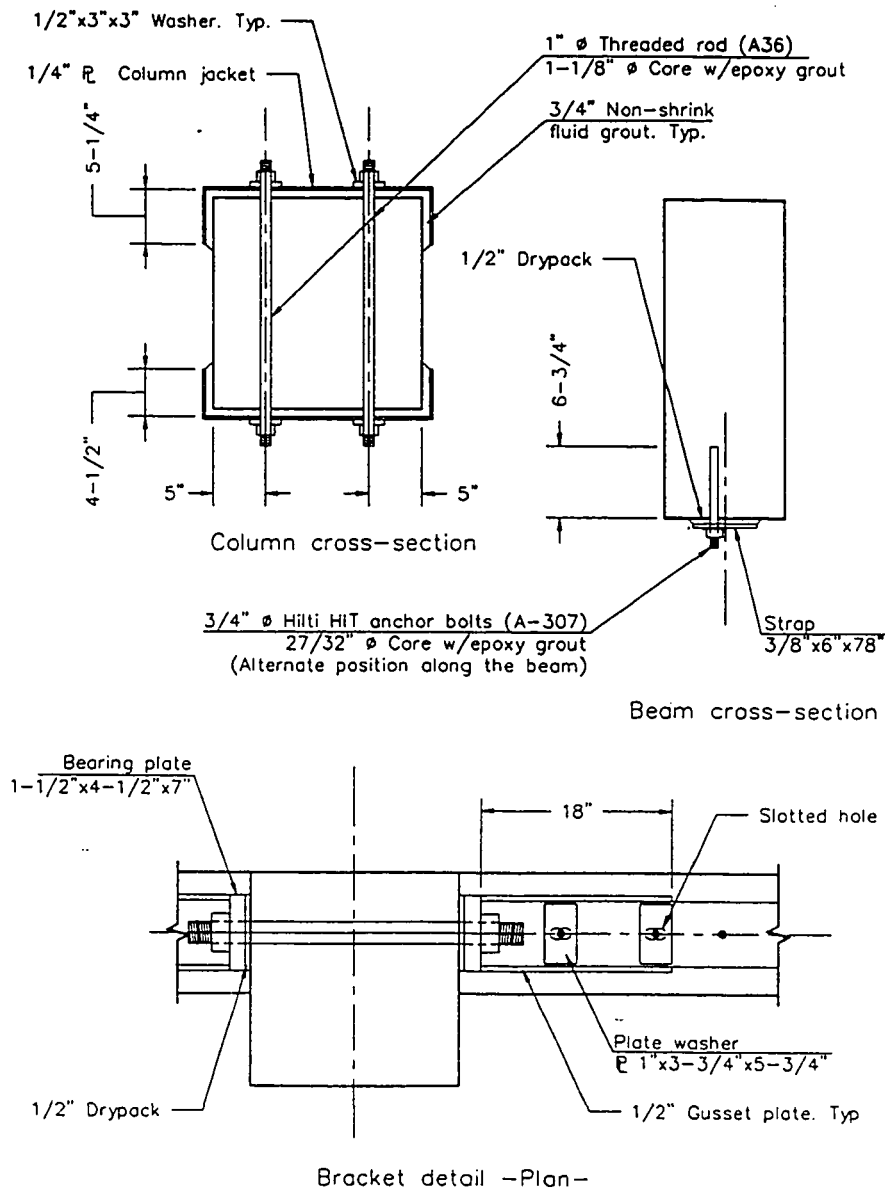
Strengthening by the Addition of Steel Plates, Sections Through Strengthened Column and Beam Ref. [20].
